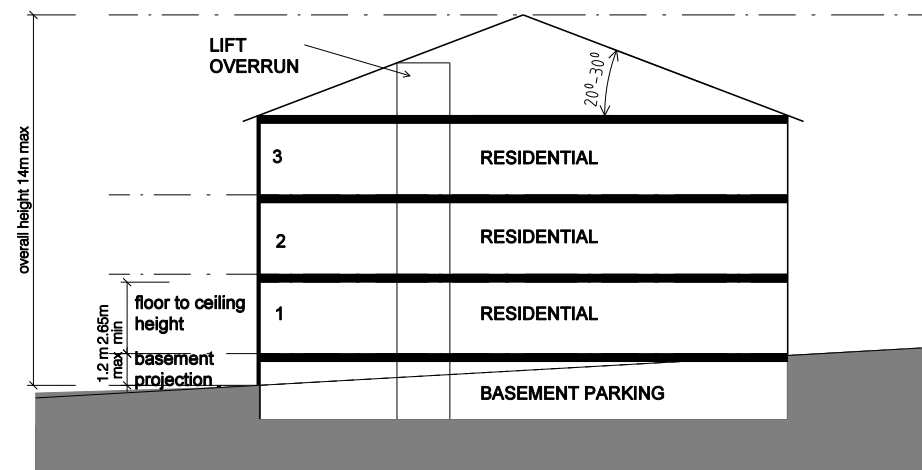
3 Storey Apartment Building Height Control
